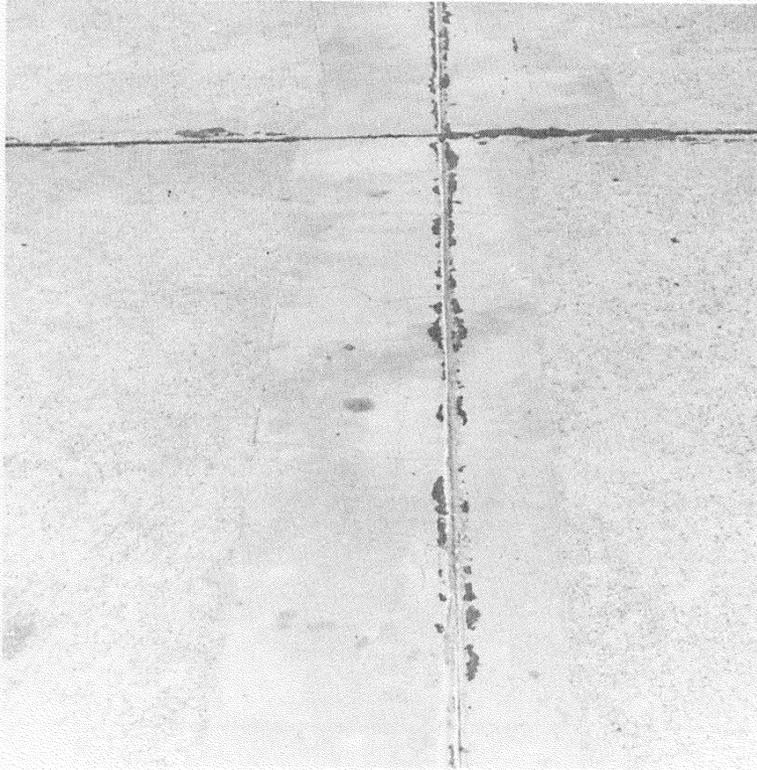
Cracking in longitudinal construction joint in runway
